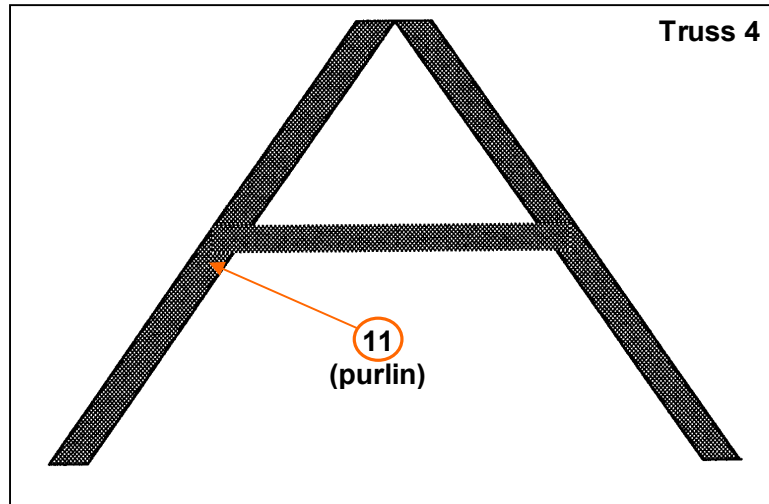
ii: Main or stables range roof trusses to show sample locations (viewed from east looking west)
